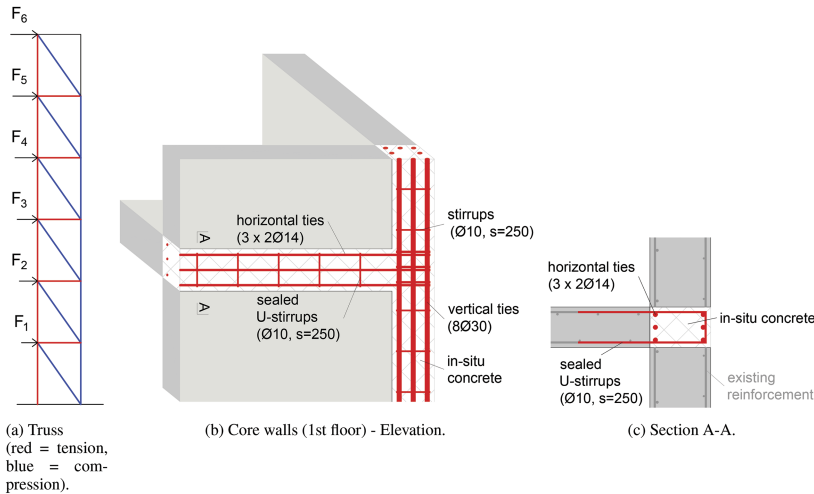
Design of new bracing system with reclaimed concrete walls to resist lateral forces.
